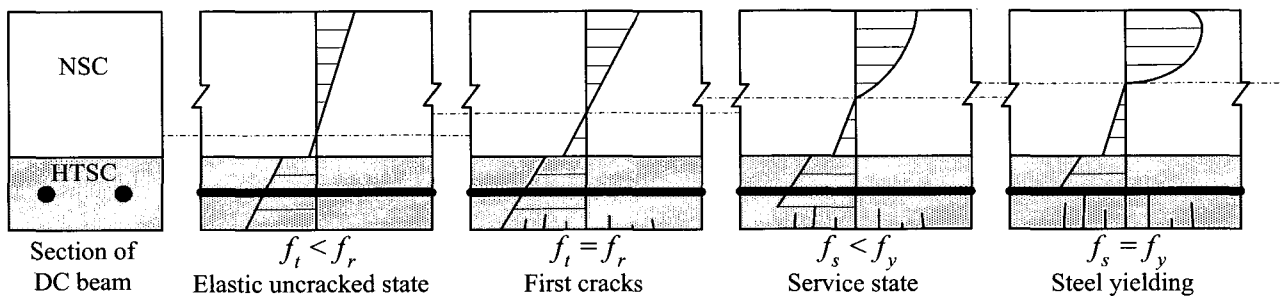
Stresses and cracks of DC beam for each states (HTSC: High Tension Strength Concrete, NSC: Normal Strength Concrete)
